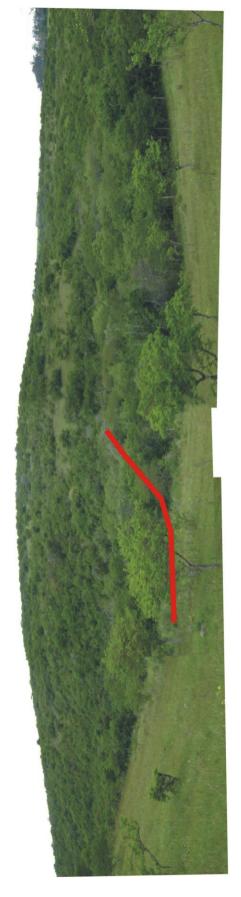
Panoramic view of the watercourse and area where the proposed earth dam wall will be constructed, looking east-southeast.
